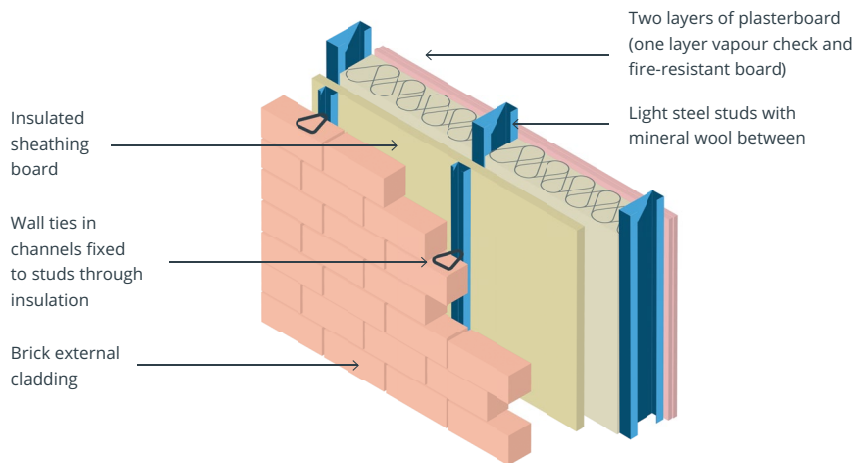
Elemental build-up for an external wall (reproduced with permission from SteelConstruction.info)
